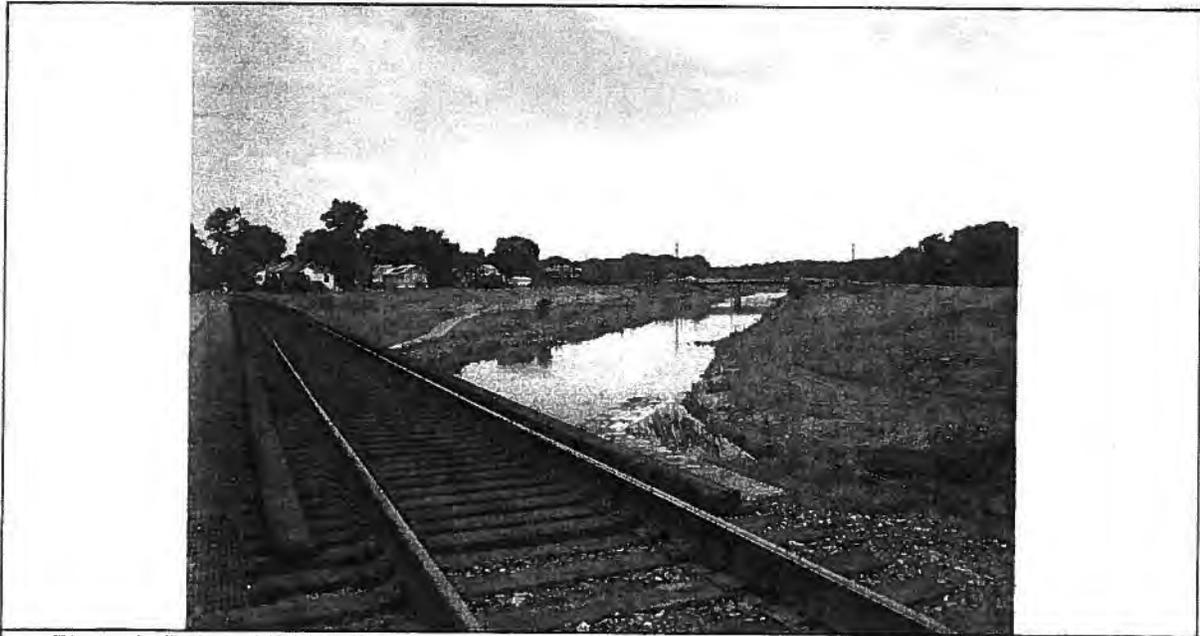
Railroad bridge over East Fork of Anacostia River, looking upstream, STA 24+00.
